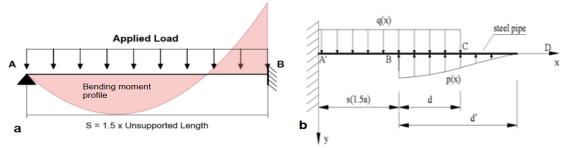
a). Analytical model proposed by John & Mattle (2002) b). Mechanical model of pipe roof reinforcement during tunnel excavation (Wang & Jia. 2008)
